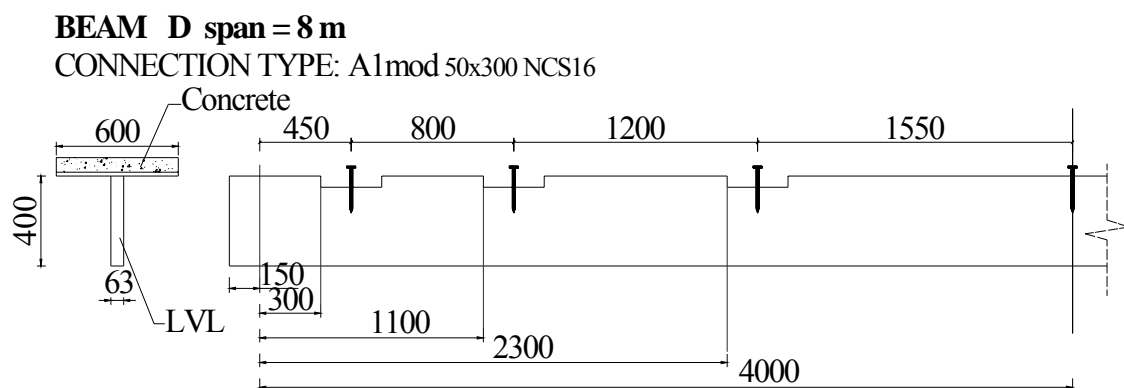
A typical 8 m TCC beam with a 300 mm length rectangular notched connection (dimensions in mm)
